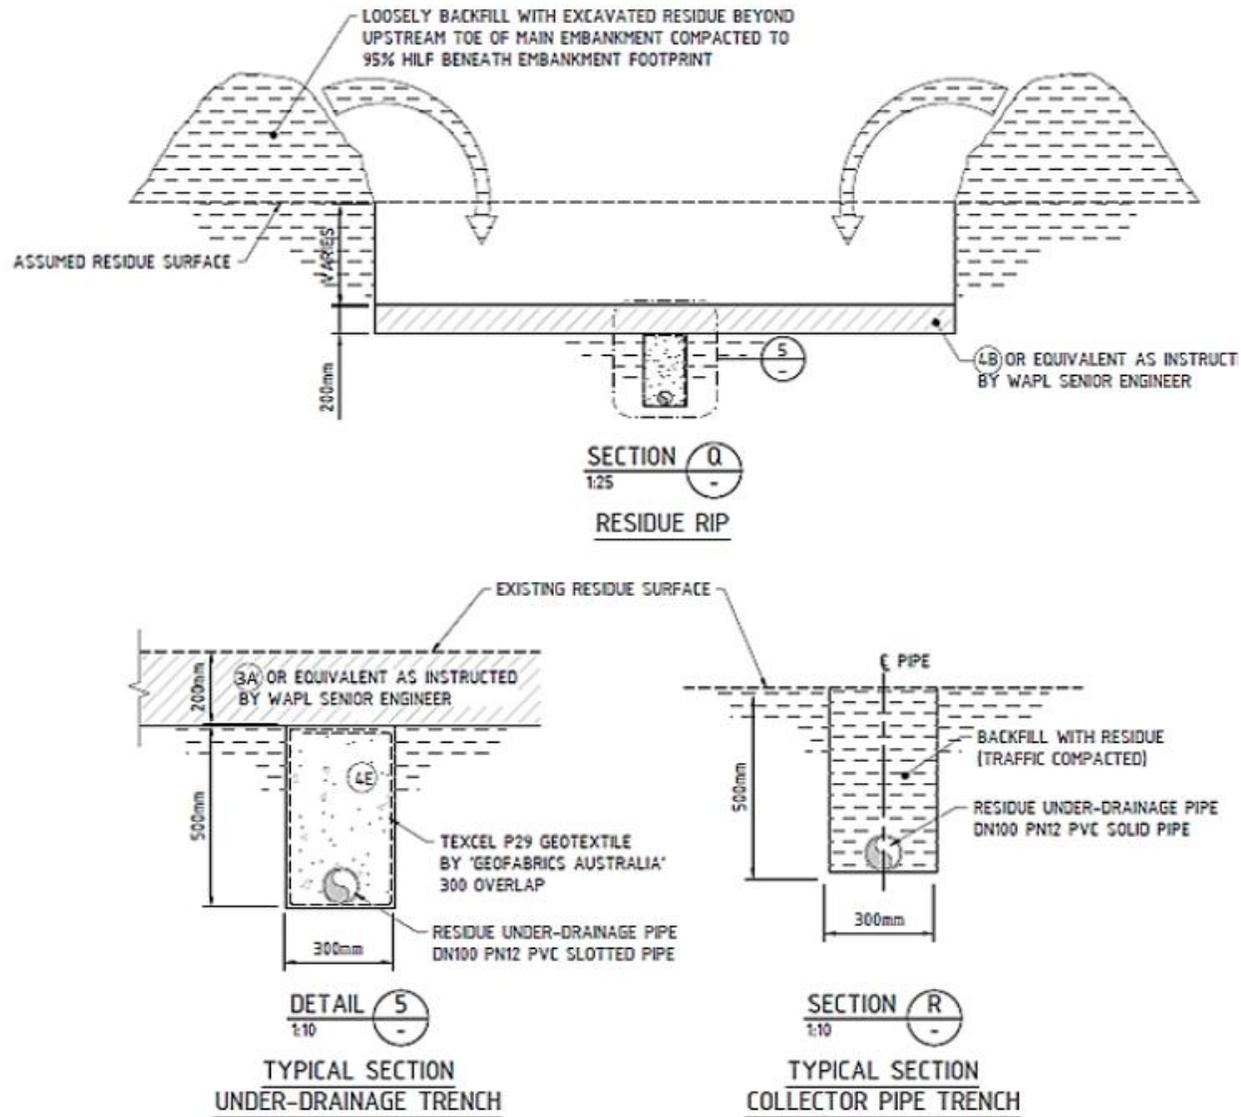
Underdrainage trench – BRDA 5 Stage 7
